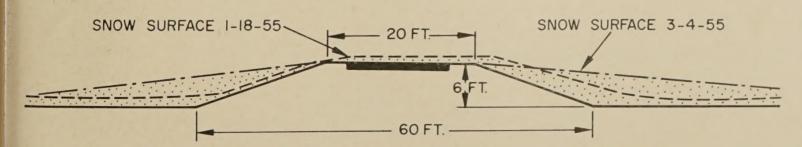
Drift formation against a test embankment (Gerdel, 1960).
